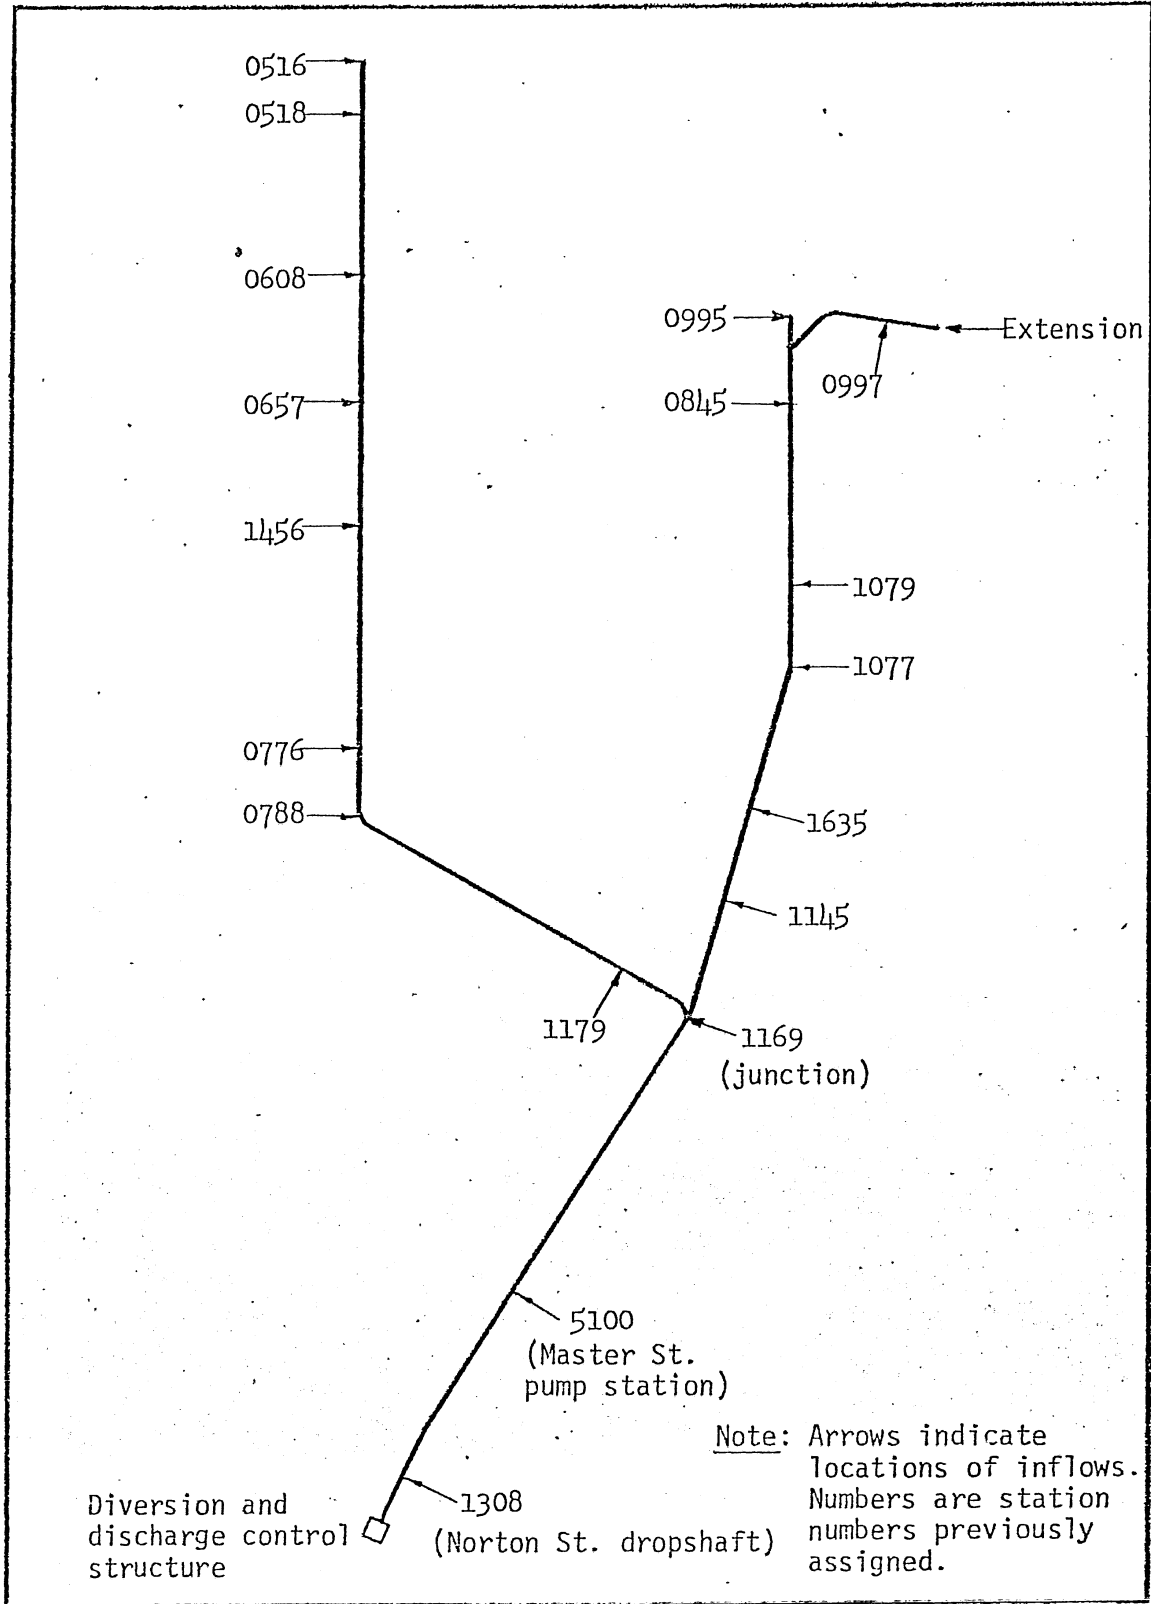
General Layout of the Culver-Goodman Tunnel.
